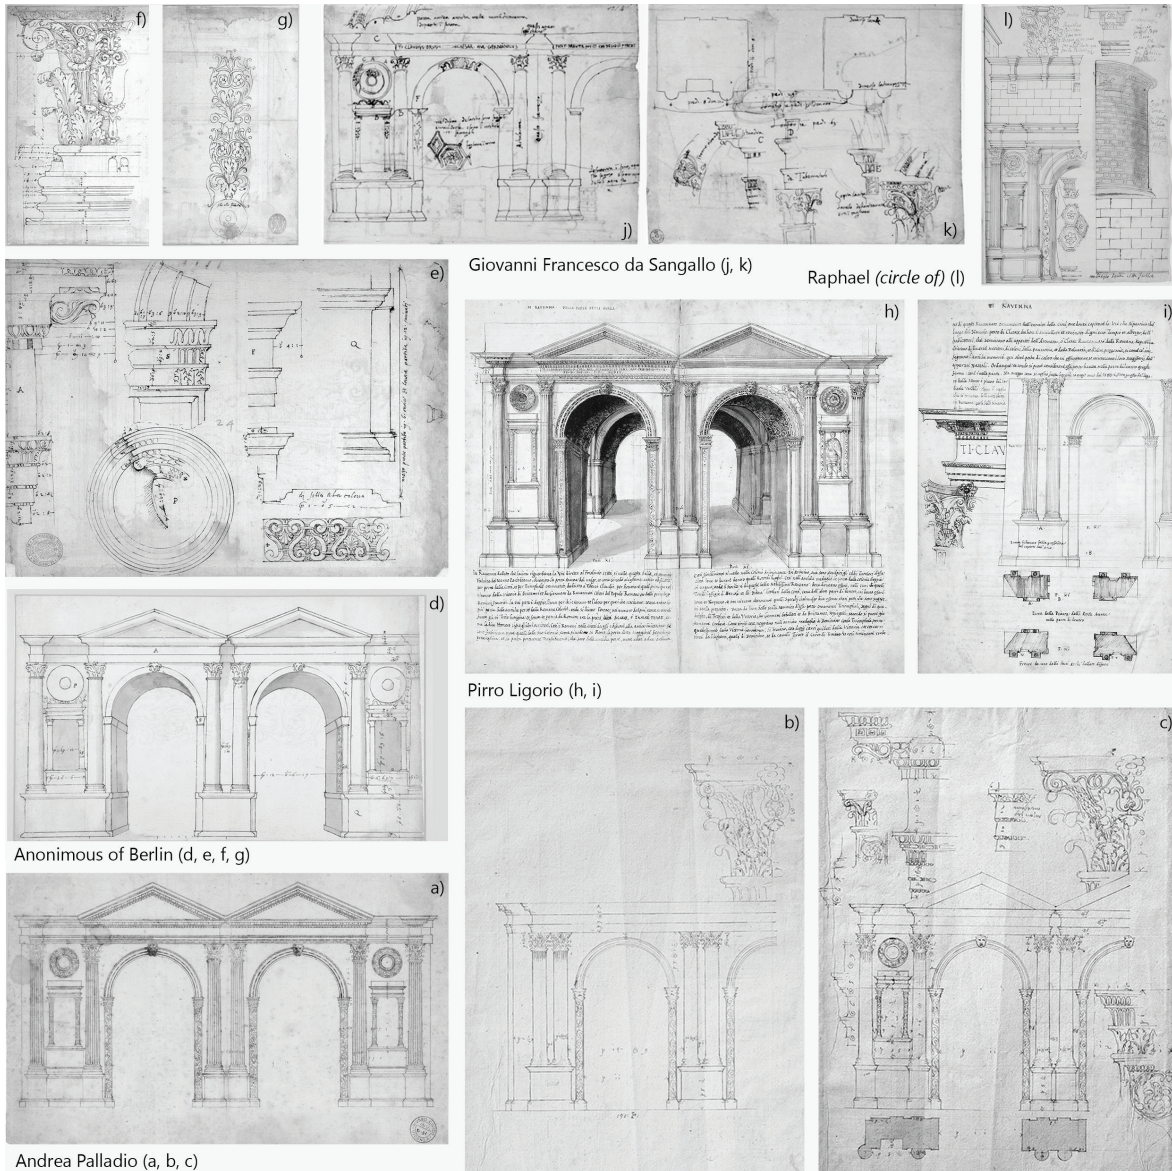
Collection of drawings representing Porta Aurea in Ravenna. Image layout by the author.
